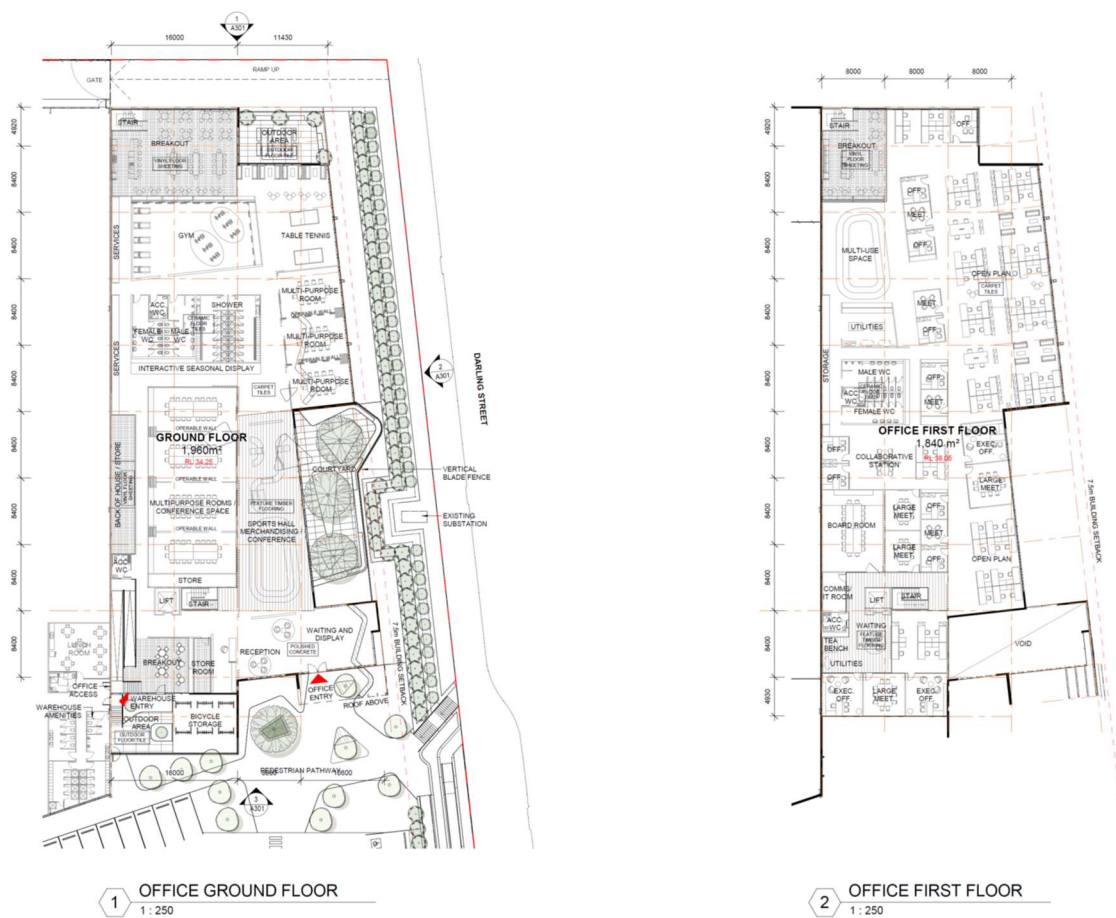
Floor Plan – Office (Source: Reid Campbell)
